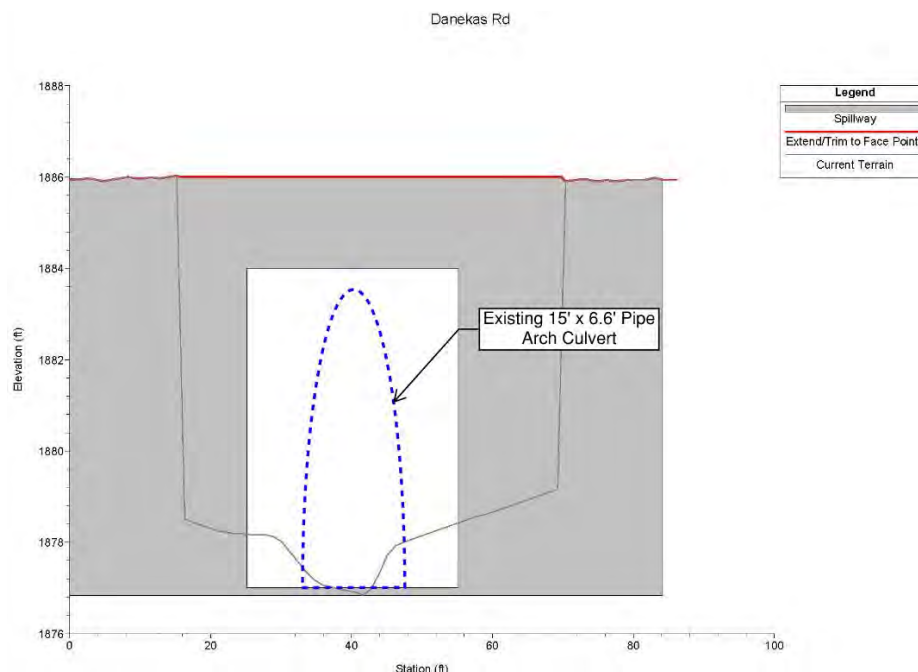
Modeled Danekas Road 30- by 7-Foot Box Culvert Schematic
